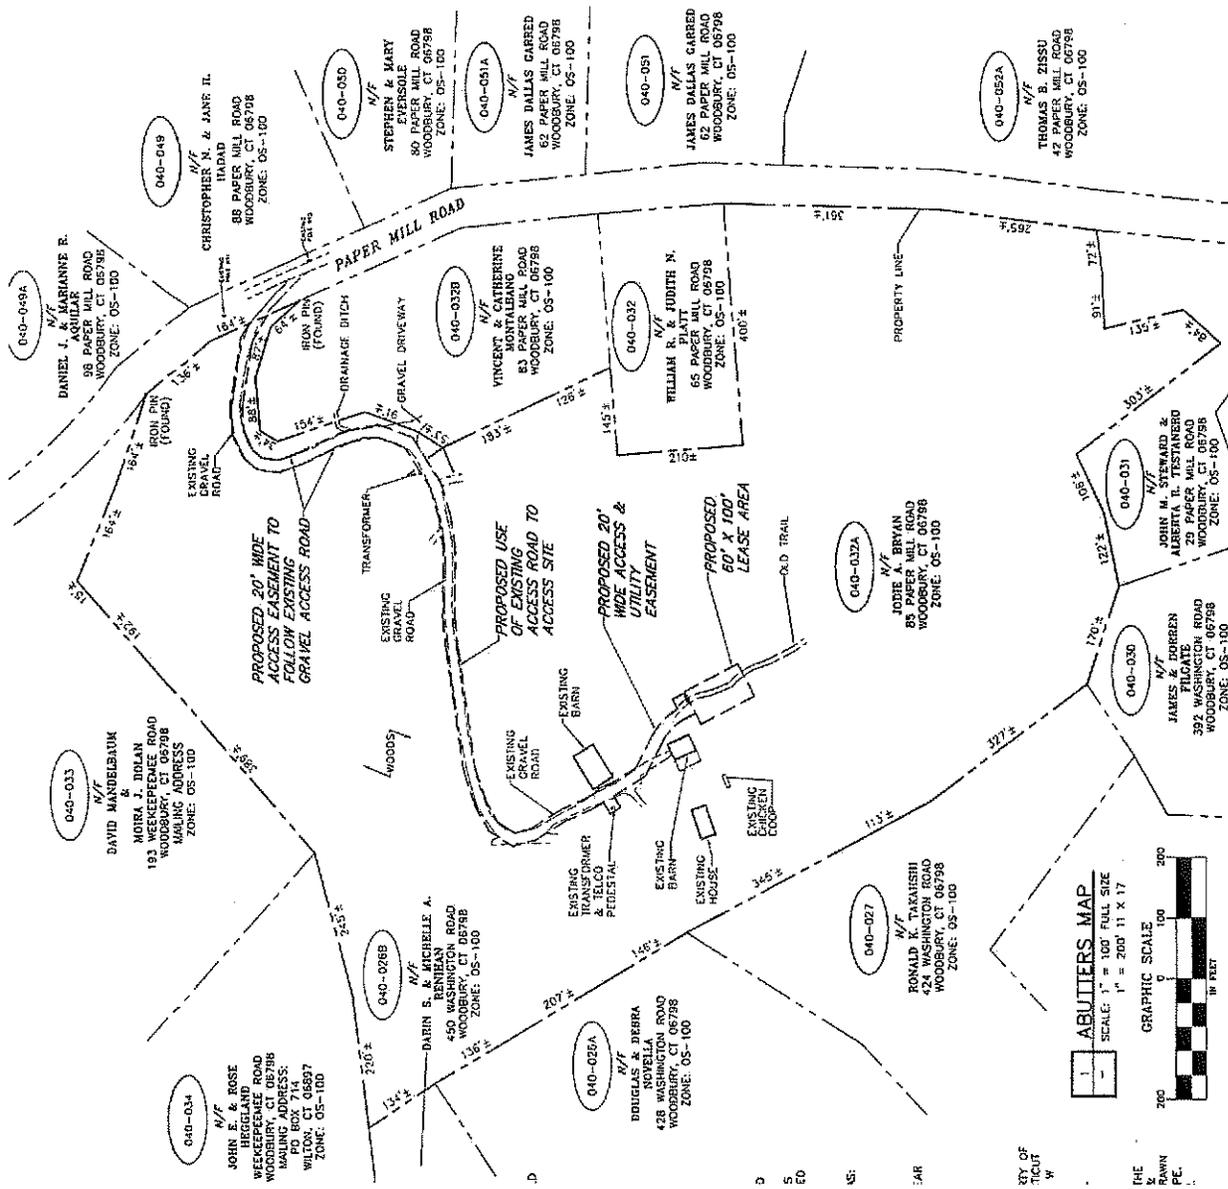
Location of site at 85 Paper Mill Road, Woodbury. (AT&T 1, Tab 3)
